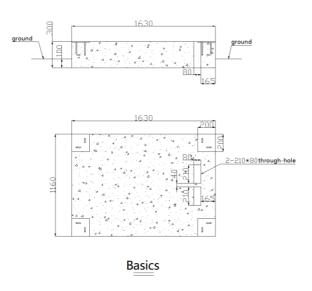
Equipment foundation drawing (unit: mm)
